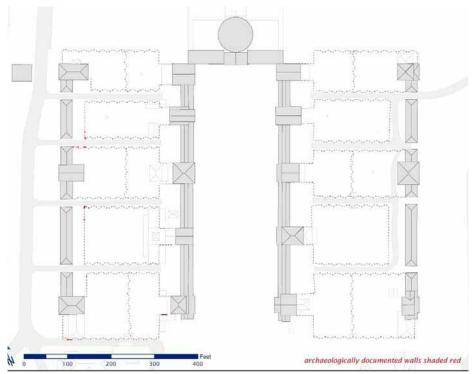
Maverick Plan adjusted based on archaeological documentation of as-built walls for comparison to Maverick Plan. (R-JAV-RAS-Adjusted Maverick Garden Walls_1825.jpg)
